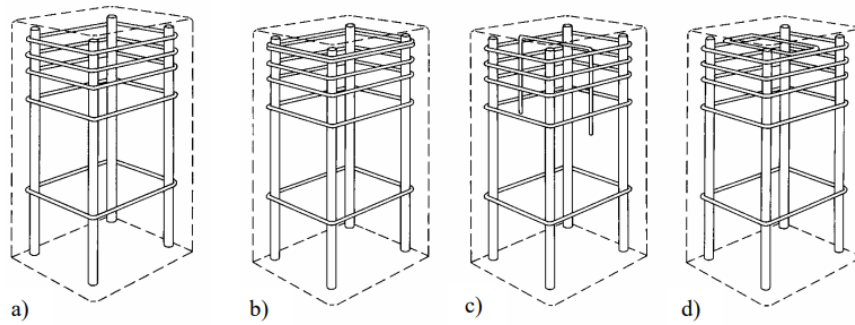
Column head splitting reinforcement, a) normal, b) additional tie, c) U-shaped tie, d) special tie (du Béton, 2008)
